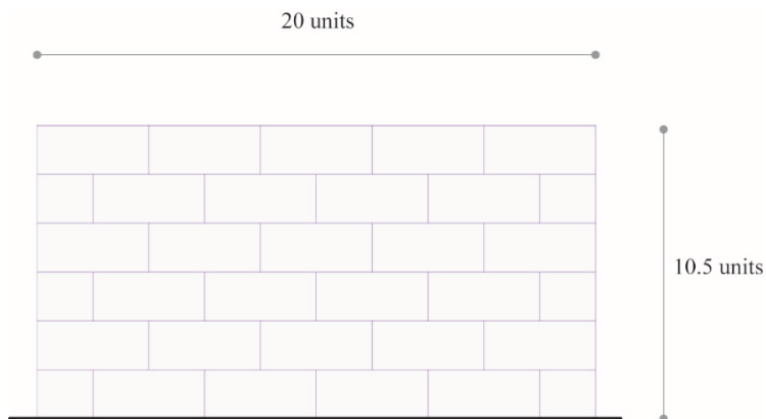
Geometric configuration of the benchmark masonry walls subjected to in-plane horizontal loading.
